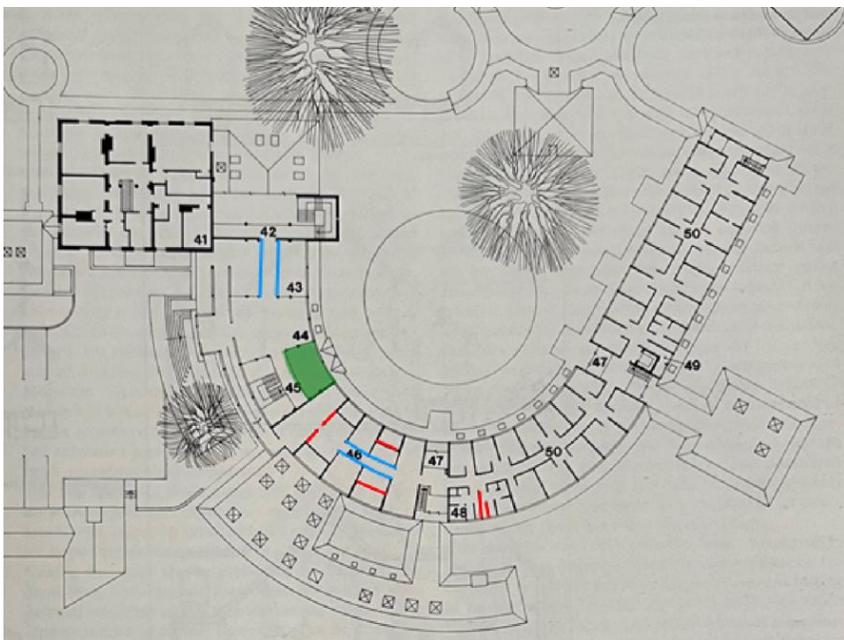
Annotated 1981 floor plan detailing walls which have been removed in the former library (red), walls inserted to create new corridor spaces (blue) and the enlargement of the former 'bridge' (green).
